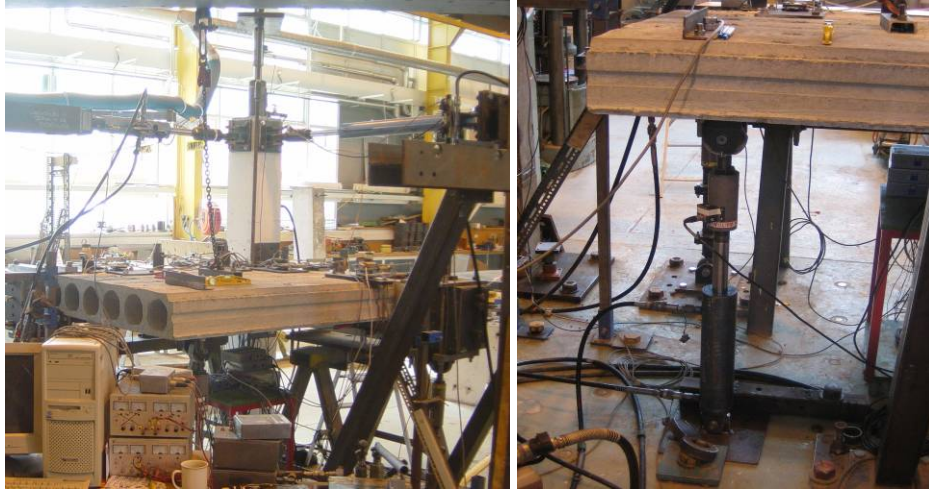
Beam-column joint with articulated floor unit: Back view (left), detail of strong floor-hollow-core connection (right).
